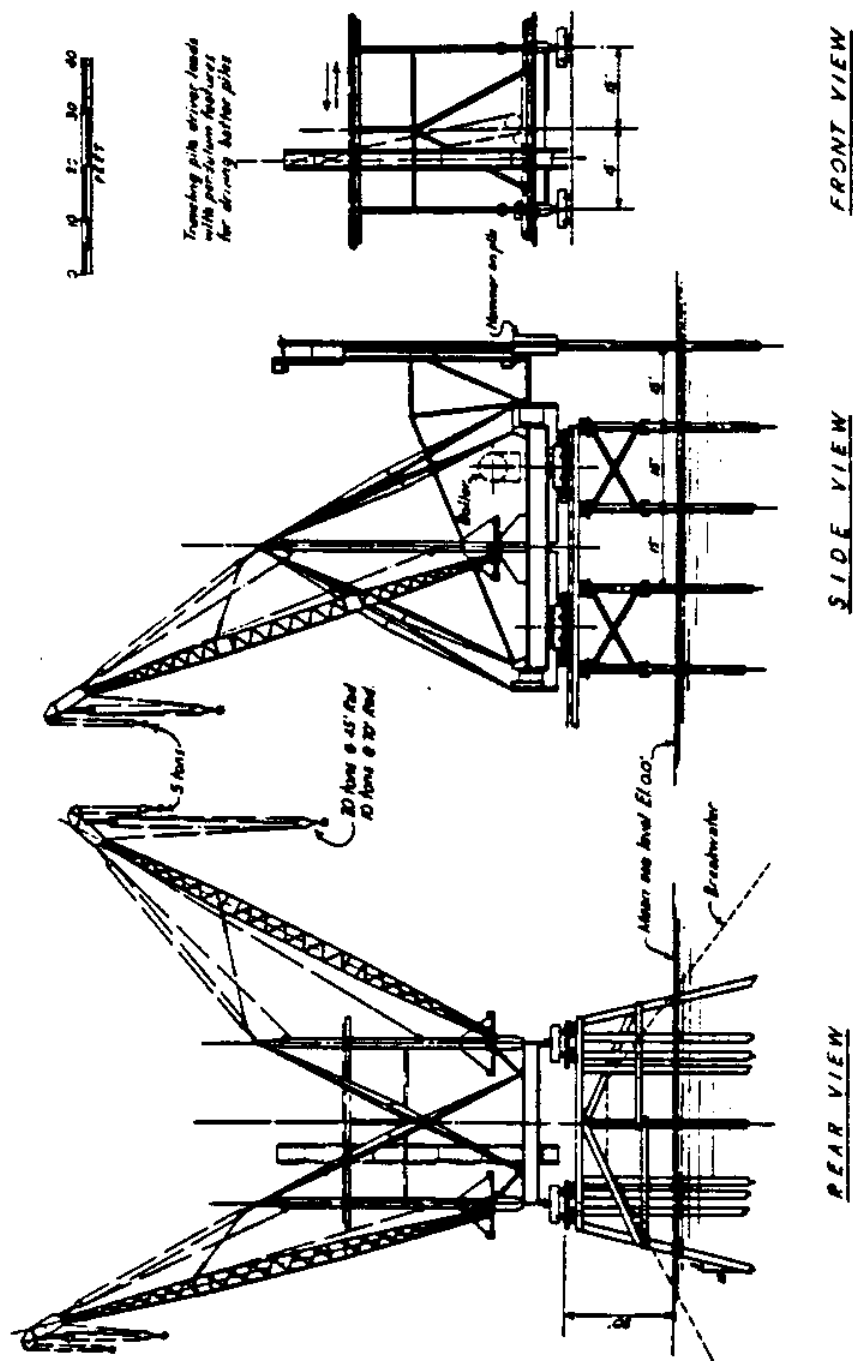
Typical Cross Section Of Trestle And Travler Used For Construction Of Coco Solo Breakwater (Quinn,1972)
